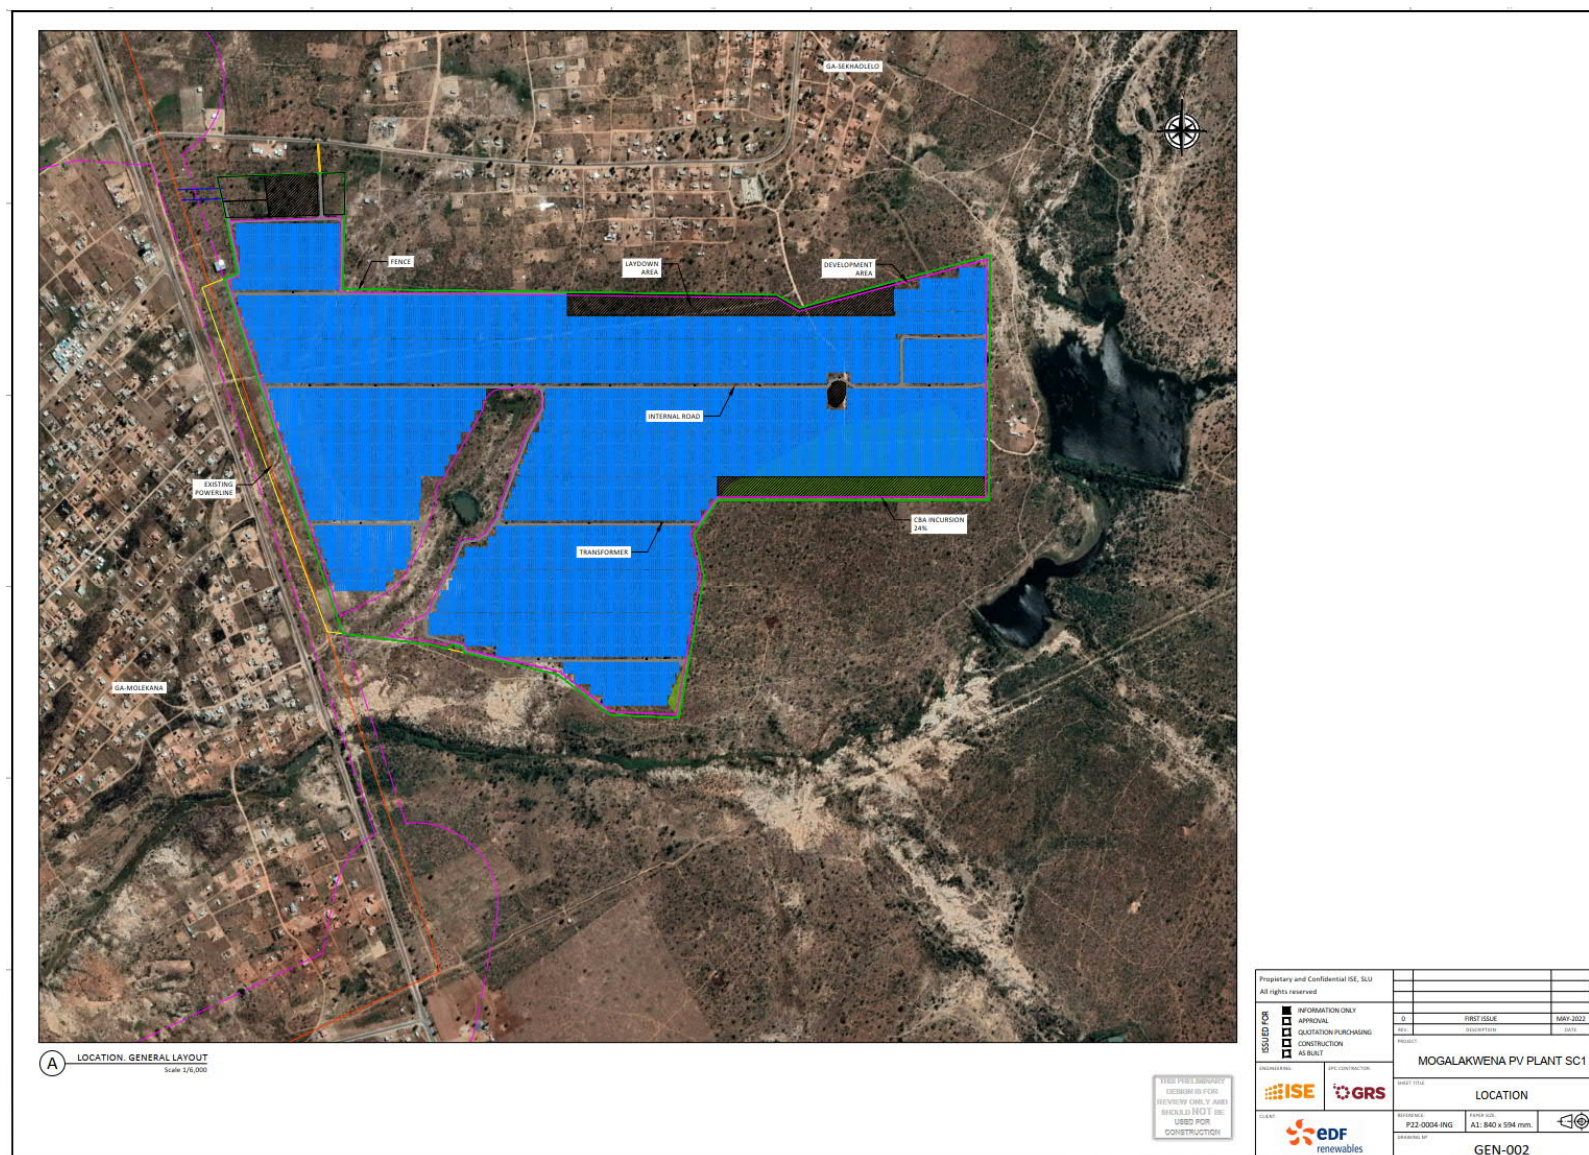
PV Plant Layout Plan within the proposed total amended footprint
